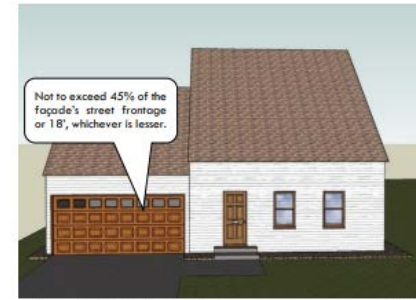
Street-facing two-car garage doors shall not comprise more than 45 percent of the facade width or 18 feet, whichever is lesser
